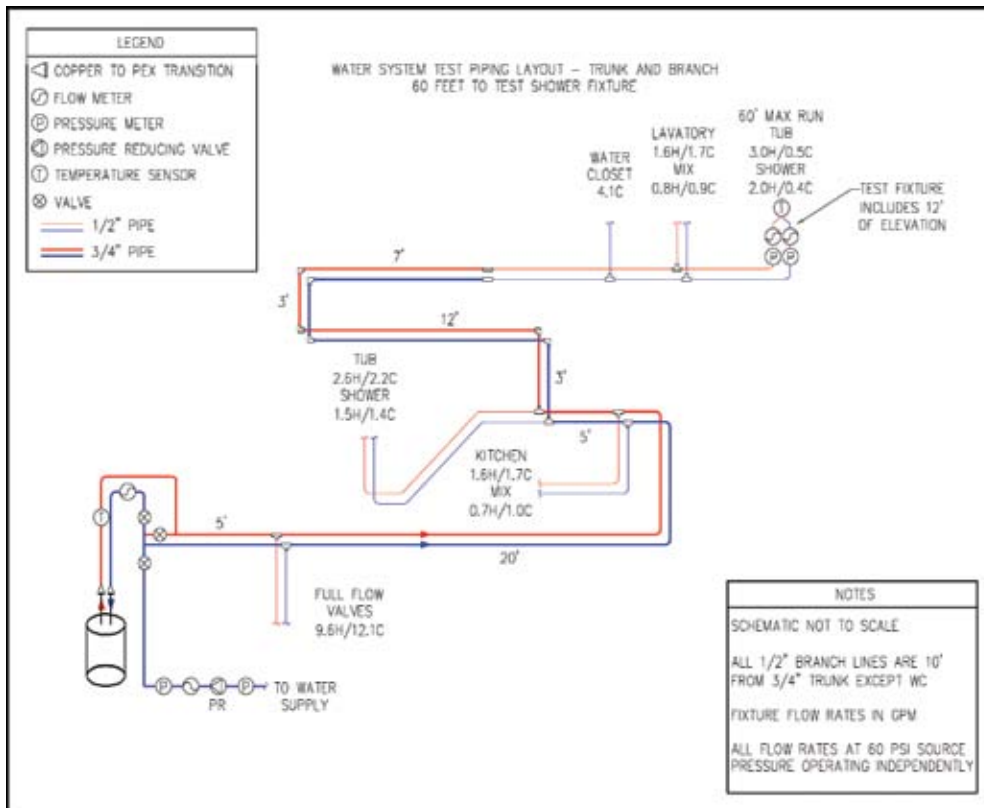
Water System Test Piping Layout – Trunk and Branch, 60' to TF
